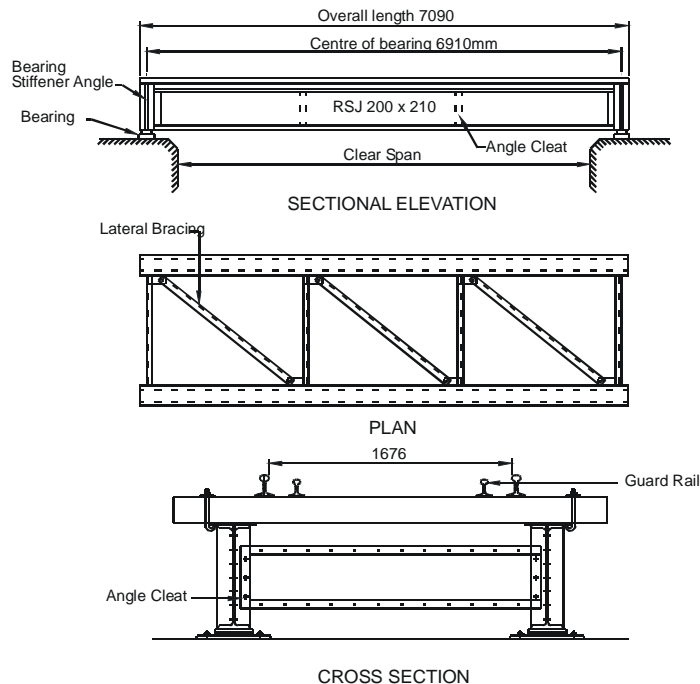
ROLLED STEEL GIRDER- 6.1 m SPAN
